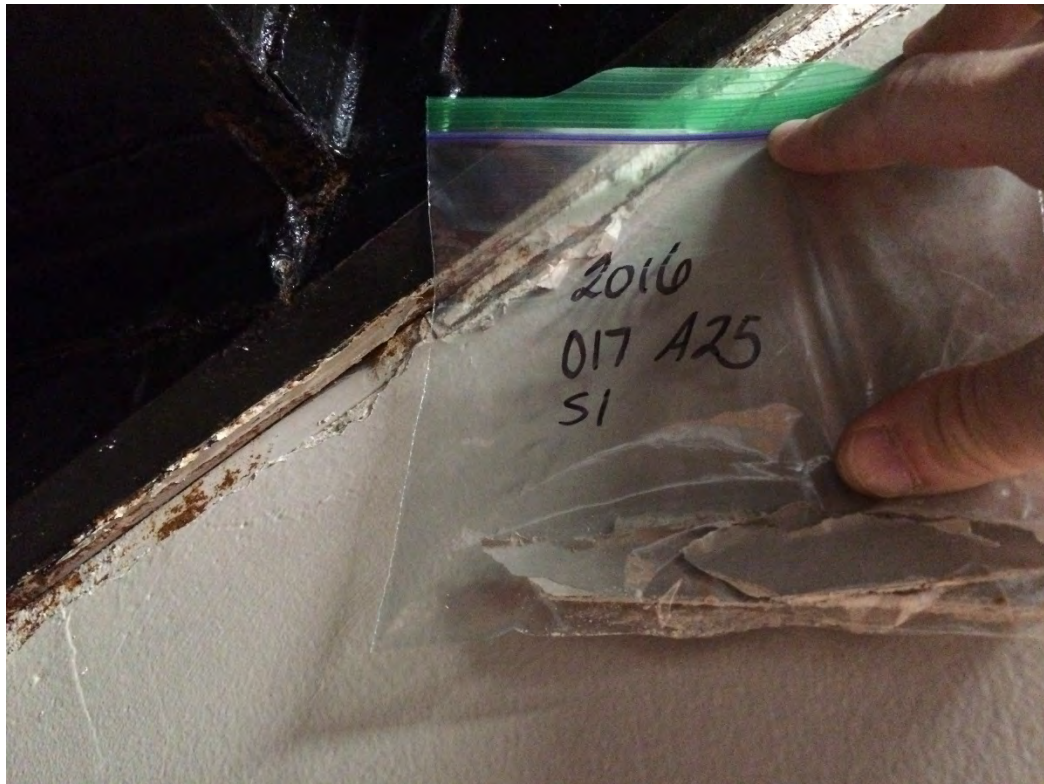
Asbestos sample A25, drywall joint compound collected from wall in O17-S1. No asbestos detected.
